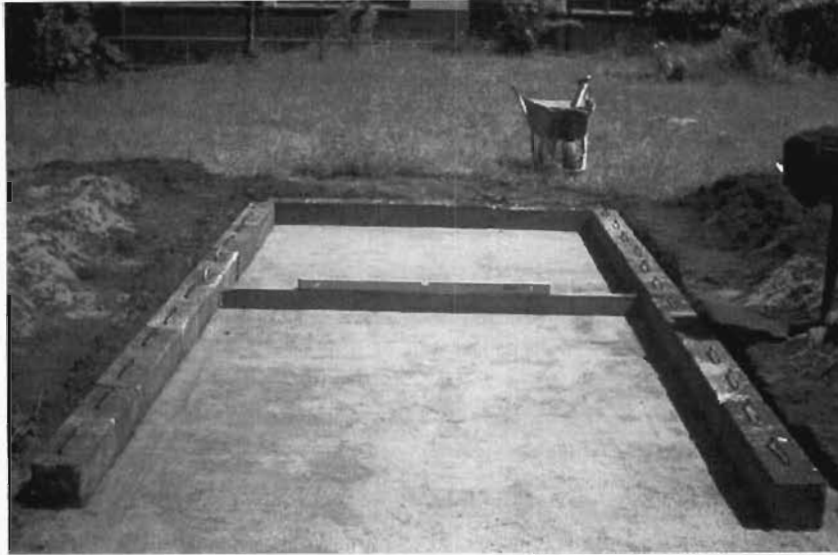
Photo of the leveled base of the model and the three concrete side walls.
